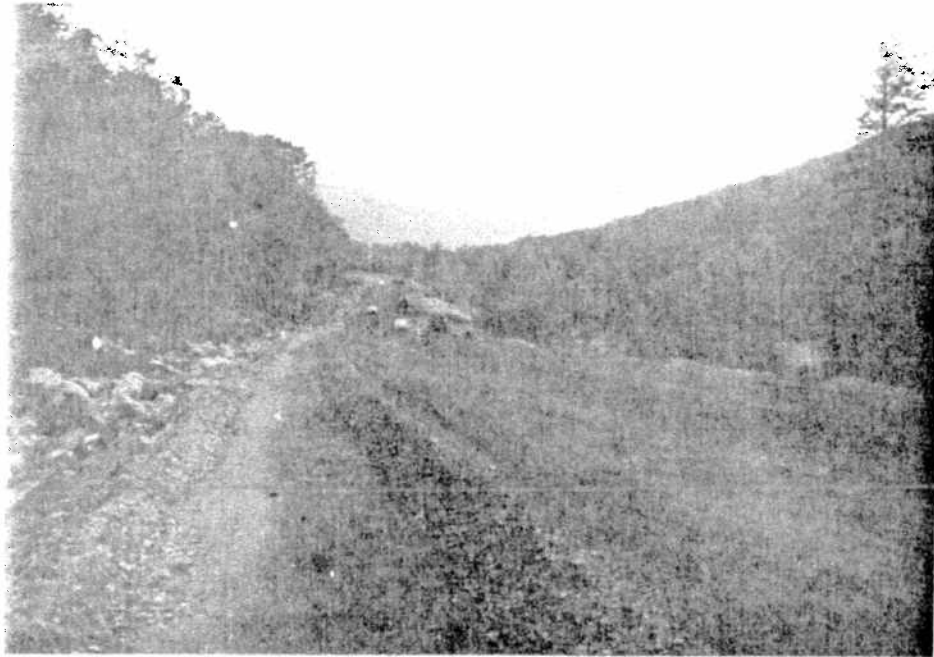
Completed Reclaimed Stabilized Base Prior to Fine Grading and Placement of Hot Bituminous Pavement (Looking North)
